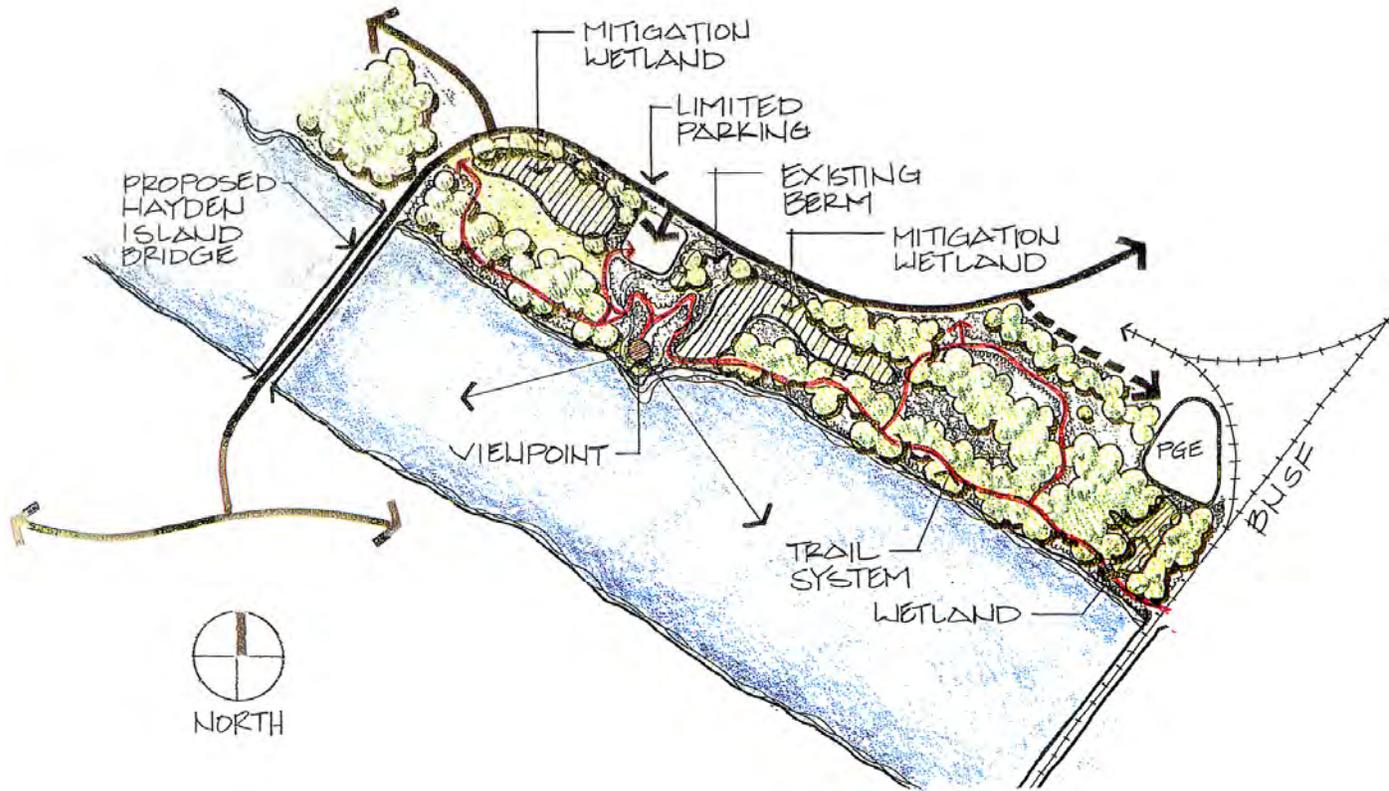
Conceptual Open Space/Recreation Plan for Area East of Proposed Bridge
